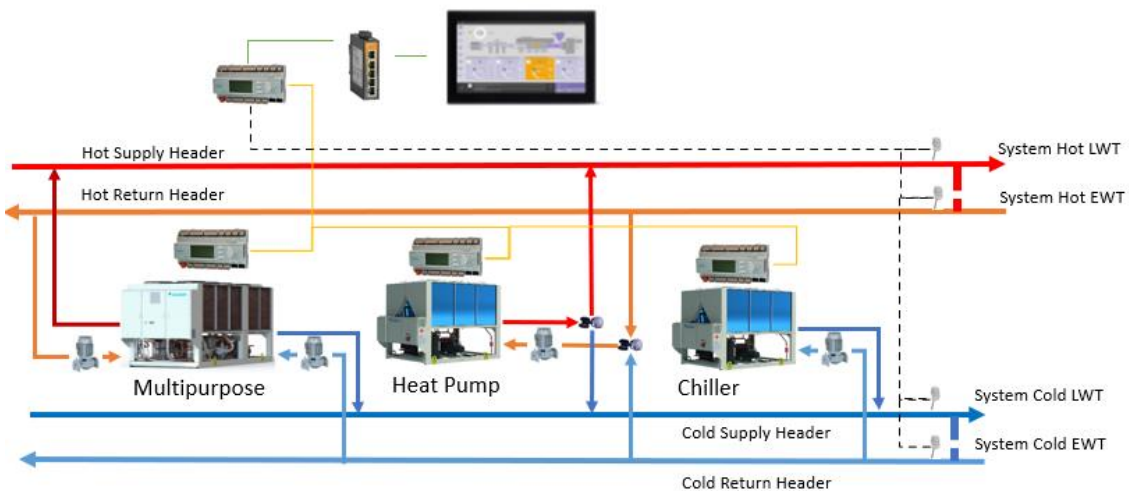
Four-pipe: Multipurpose, A/C Chiller and A/C Heat pump
